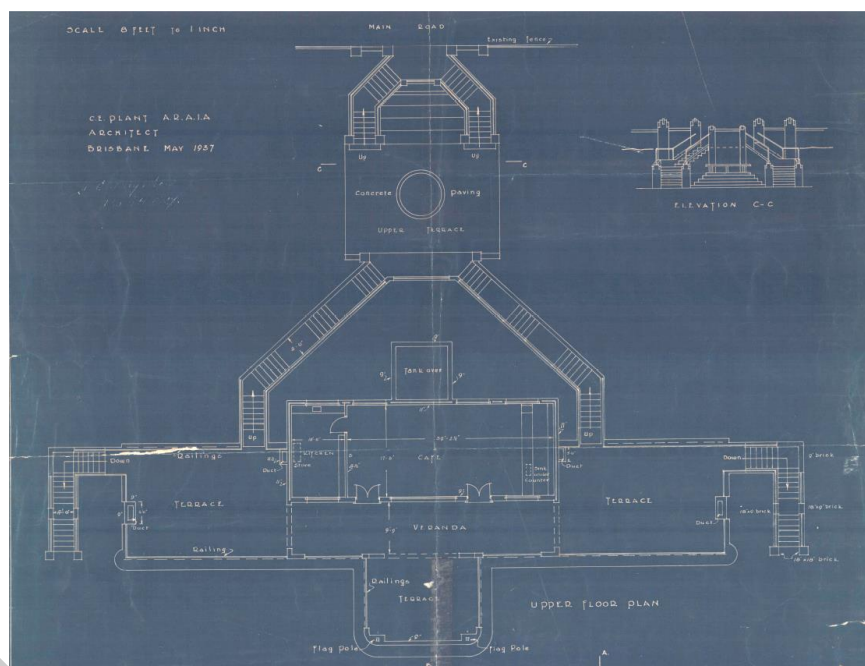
Original upper floor plan – including stairs to Marine Parade, 1937
